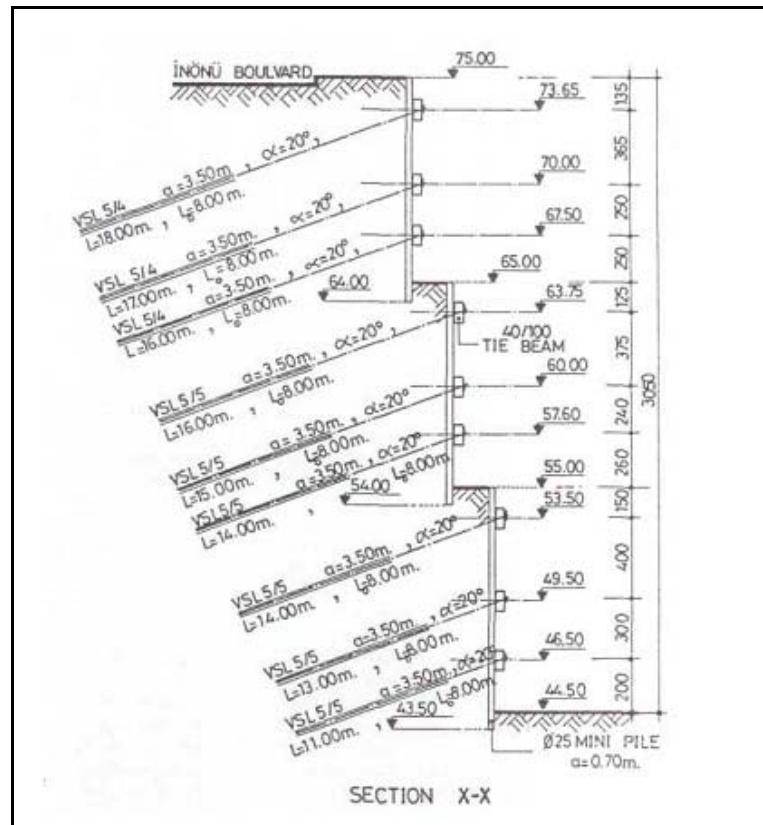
Tied back cast in-situ micro pile application on the deep excavation of Park Hotel (Candogan and Saglamer, 1991)
